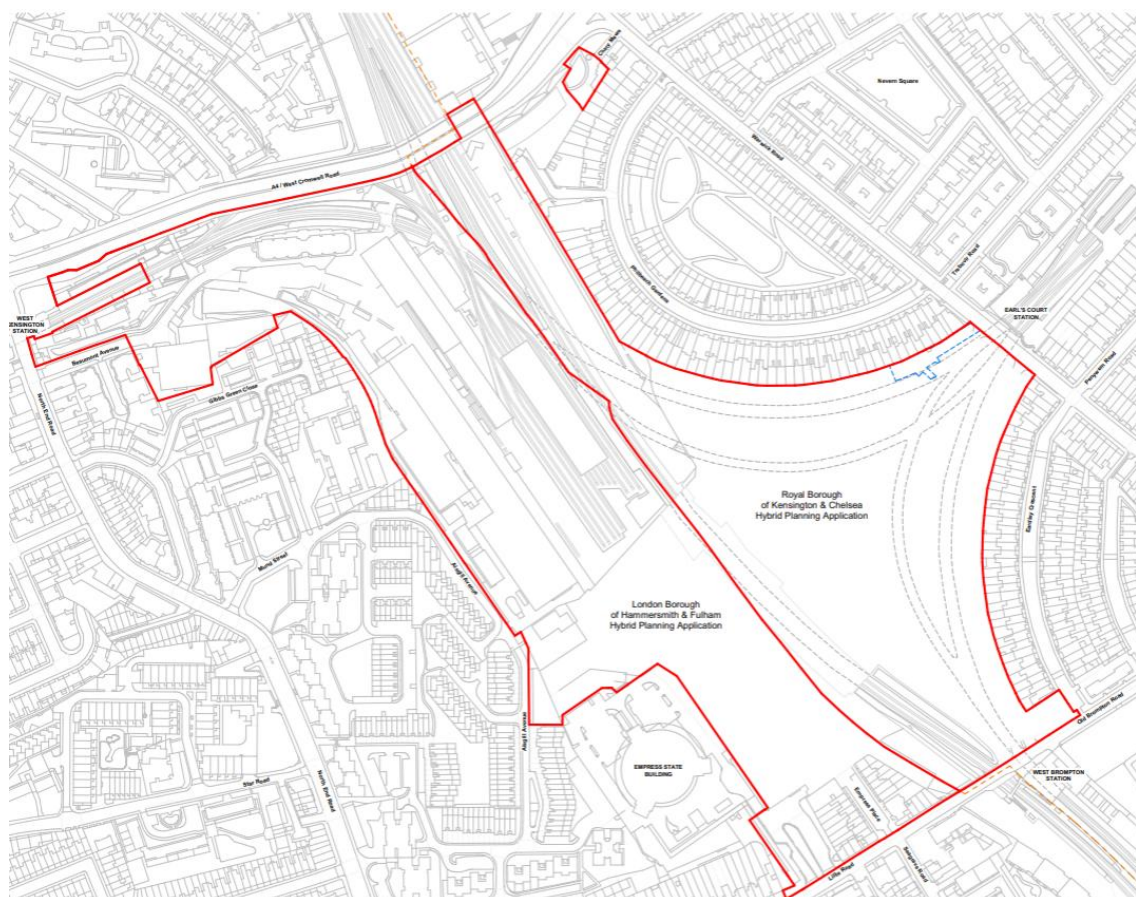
Site Location Plan Parameter Plan ref.: 001 rev P02
